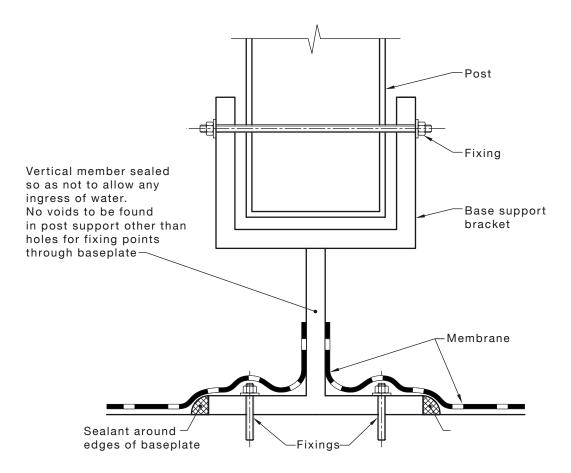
TYPICAL DETAILS OF VERTICAL PENETRATION USING A COLLAR
